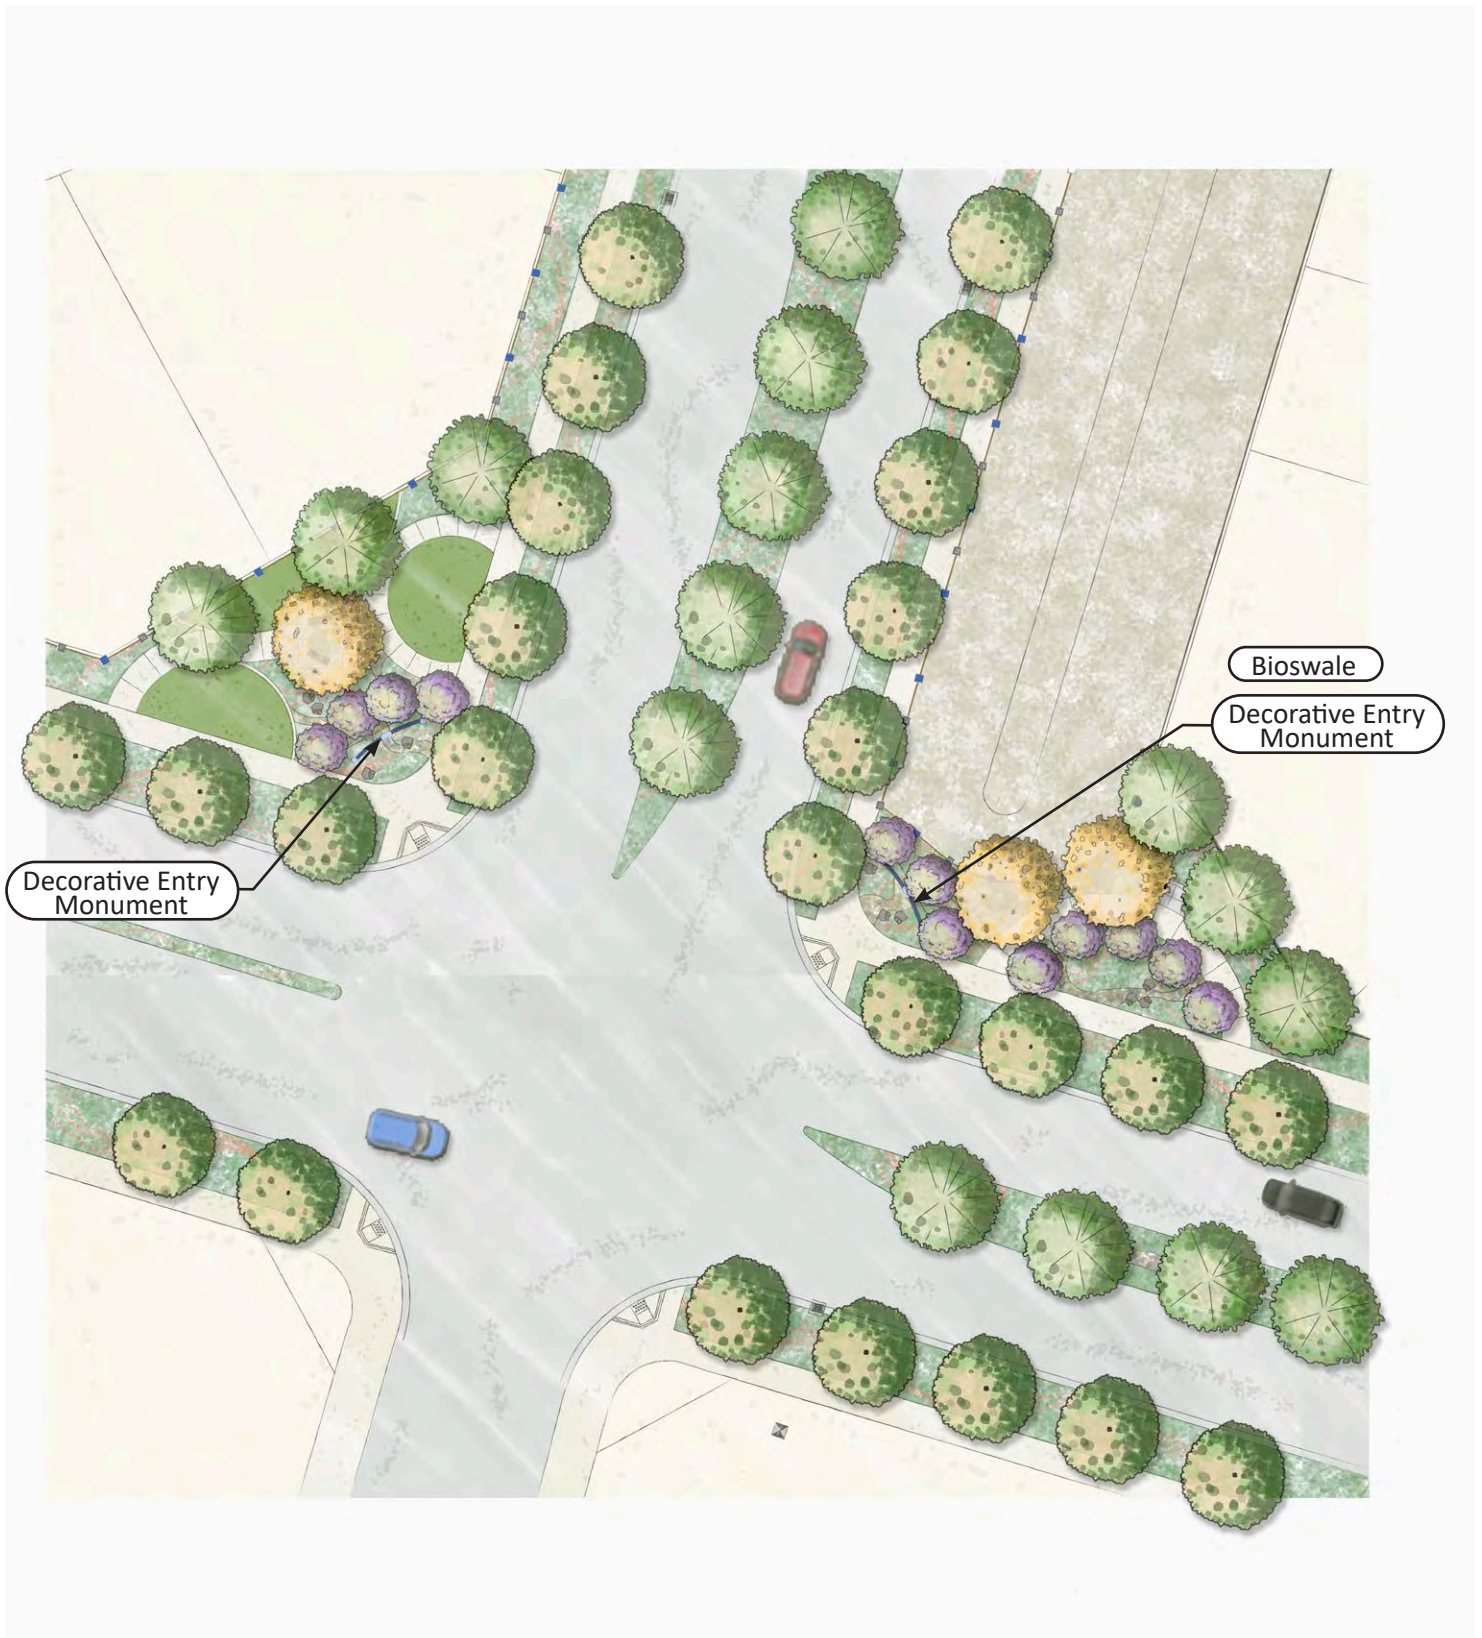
STORNOWAY AVE AND ADDISON AVE GATEWAY CONCEPT PLAN
